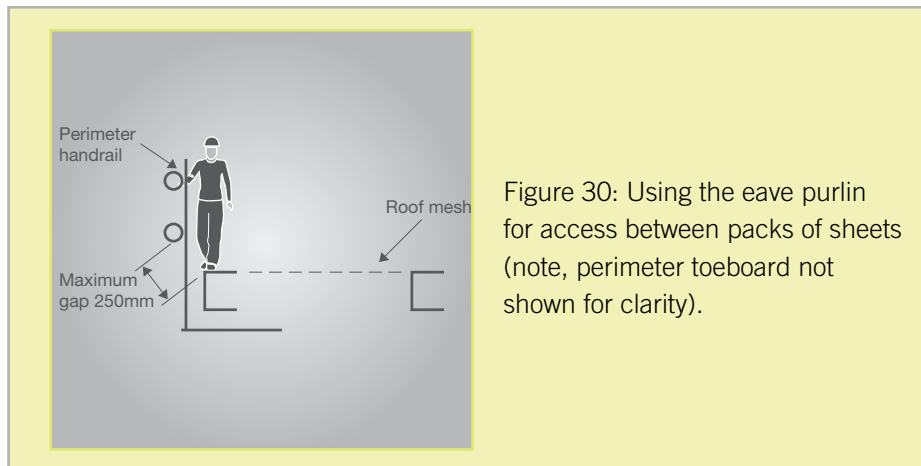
Using the eave purlin for access between packs of sheets (note, perimeter toeboard not shown for clarity).
